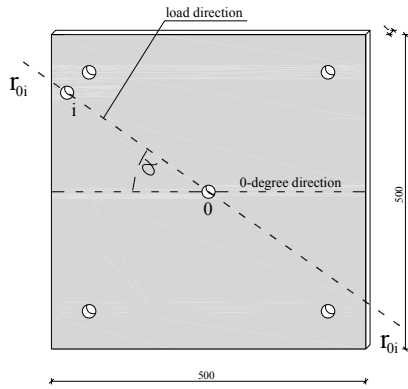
GFRP specimen: geometry (dimensions in mm).
